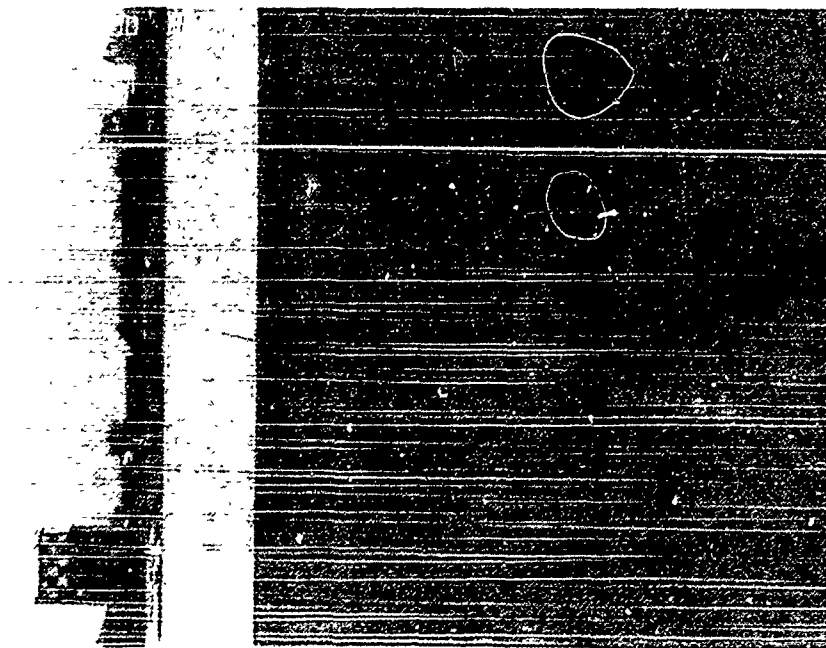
Full-Width Transverse Reflective Crack, Section 2 (Modified SAMI).
